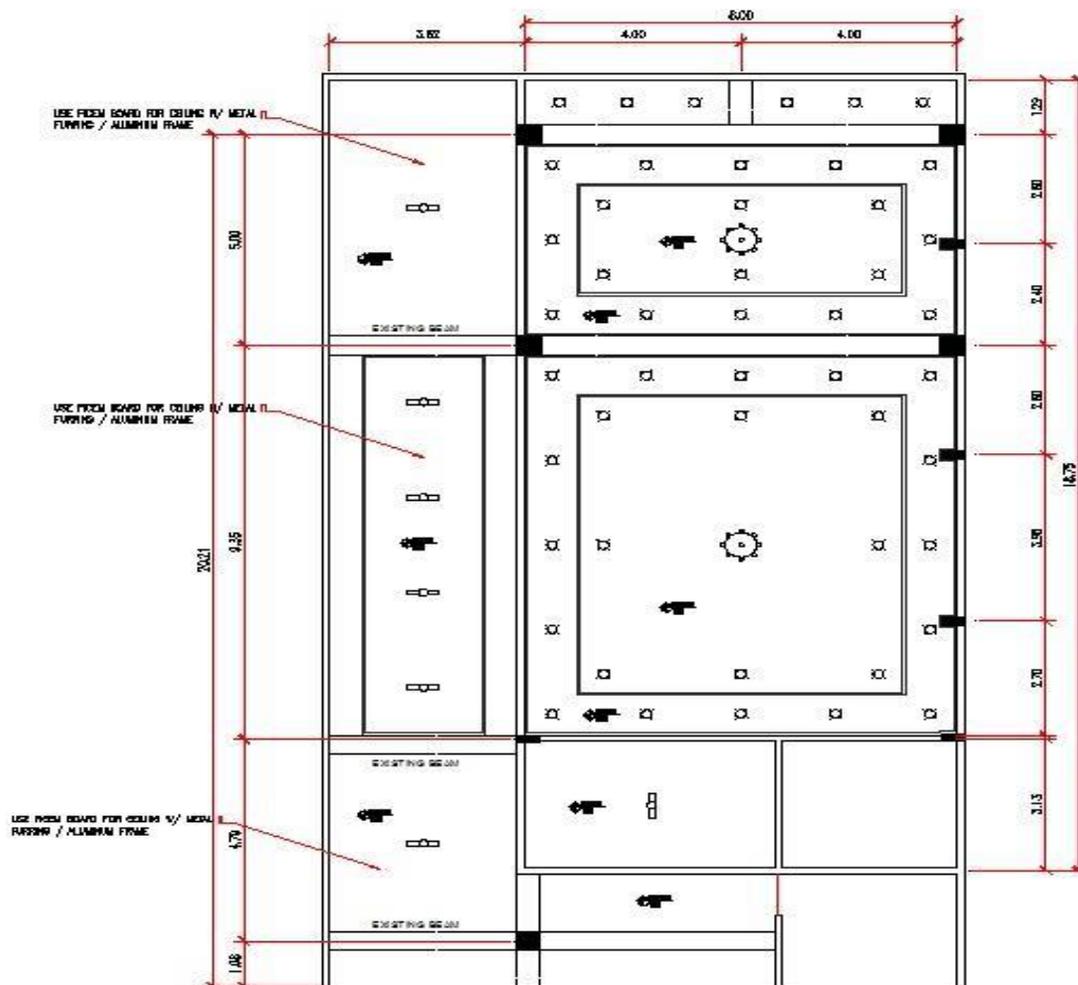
The Reflected Ceiling Plan of the COED Viewing Room
